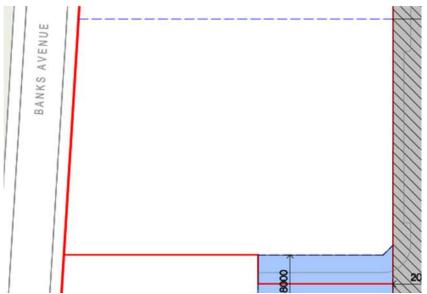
Road plan extract from approved Concept Plan (DA-2019/386)
